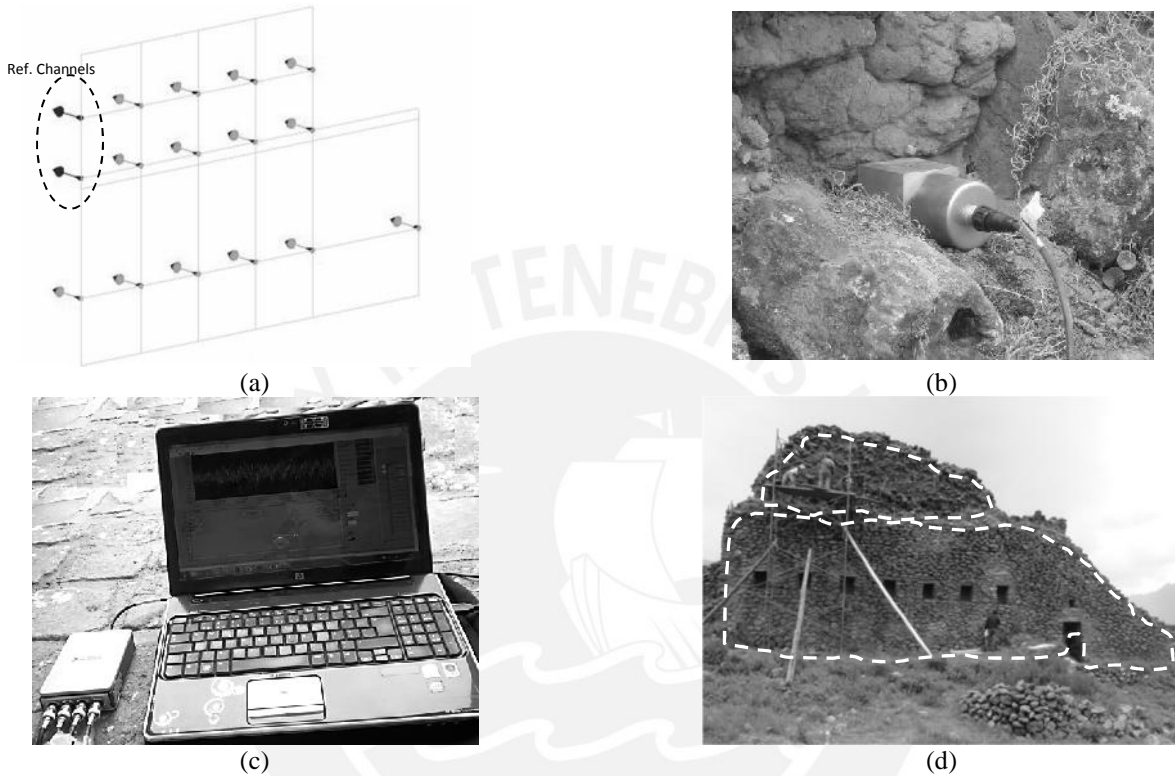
OMA tests at Chokepukio: (a) tests setup; (b) close up of a measurement node; (c) central acquisition station; and (d) general view of the instrumented wall and the process of fixing sensors
